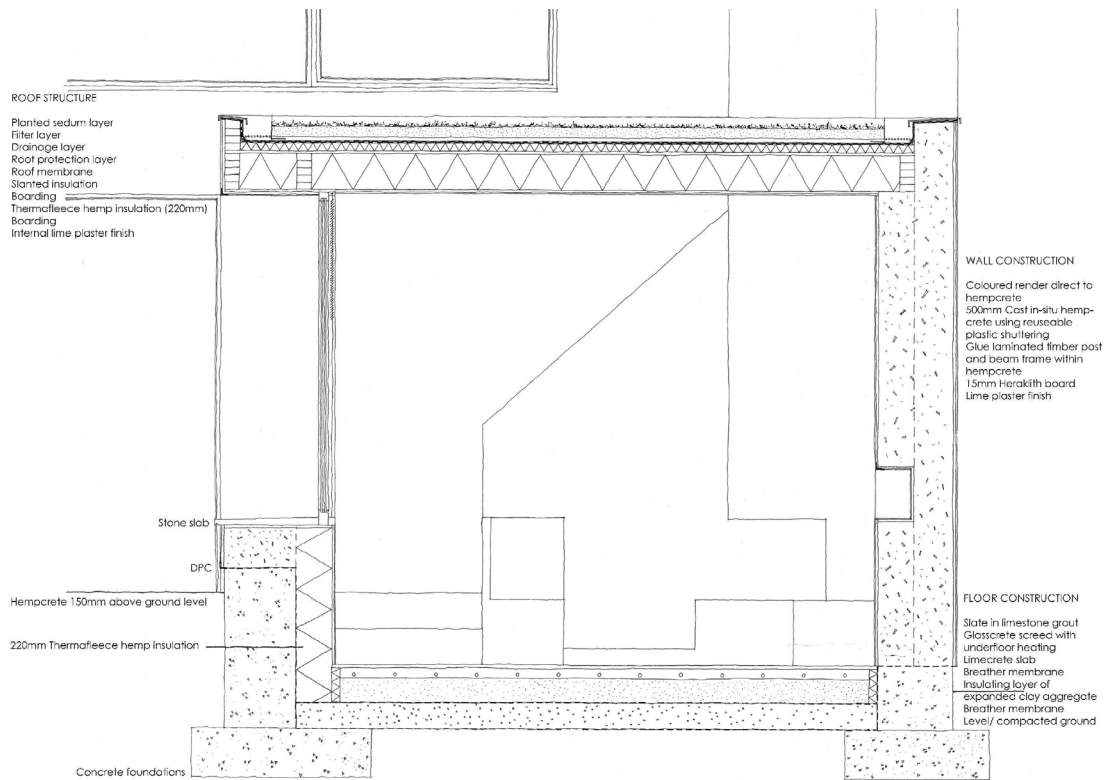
Detail of application of hemcrete construction to design of scheme of 3 bed house type of living room off a courtyard with an external window seat
